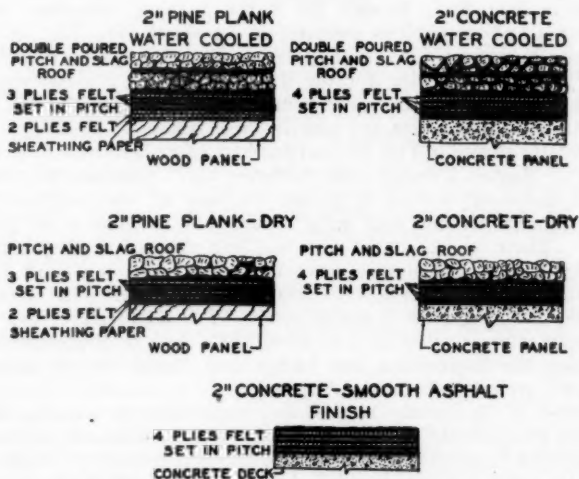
TYPICAL CONSTRUCTION OF ROOFS TESTED
